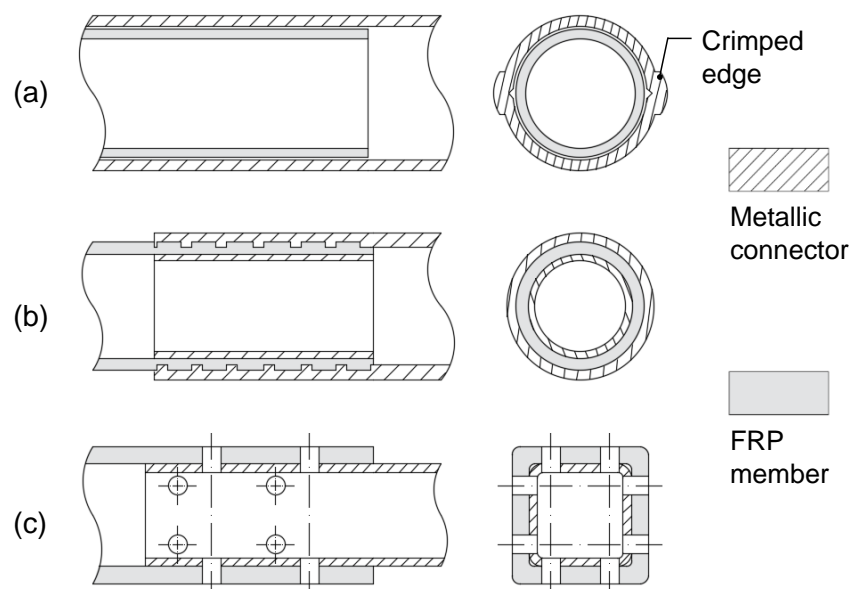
Prototypes of joints between FRP truss member and end connector: (a) crimp-bonded joint [74]; (b) pre-tightened teeth joint [76]; (c) bolted sleeve joint [77].
